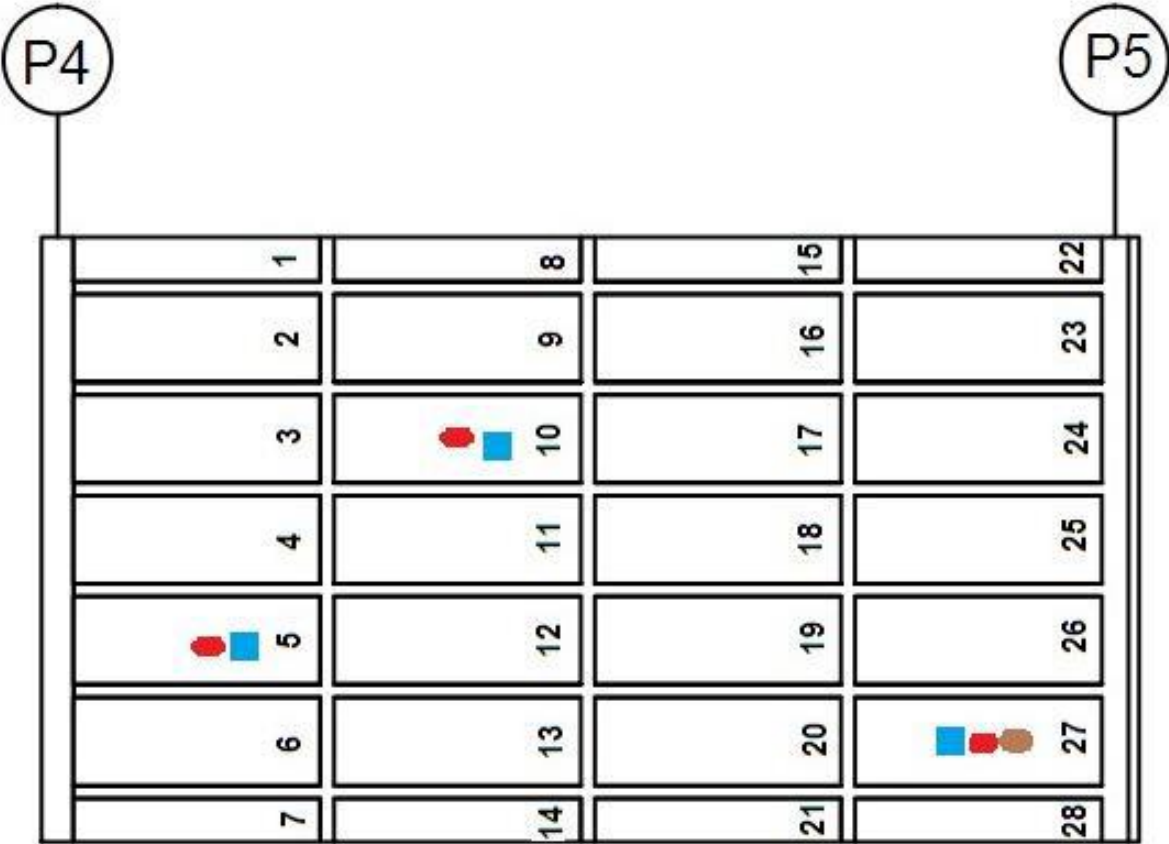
Test conducted at various locations between Pier P4 and Pier P5
